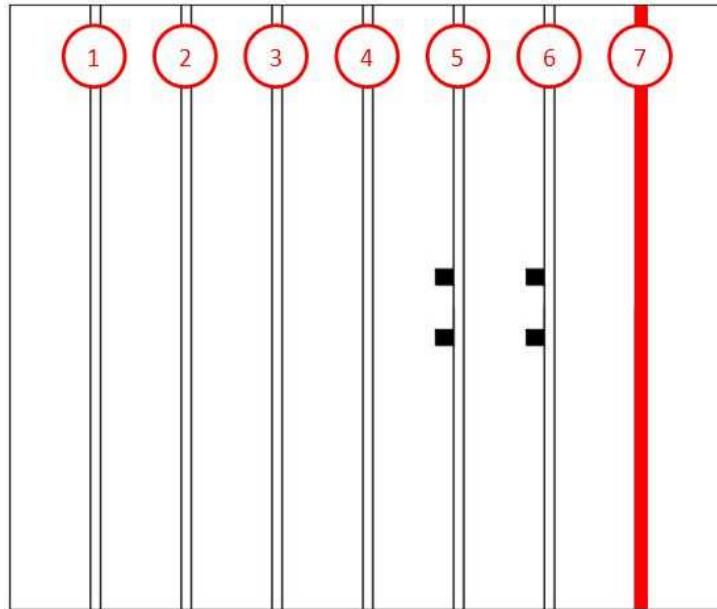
Critical load location for negative moment for a six-foot section NEXT-D bridge
